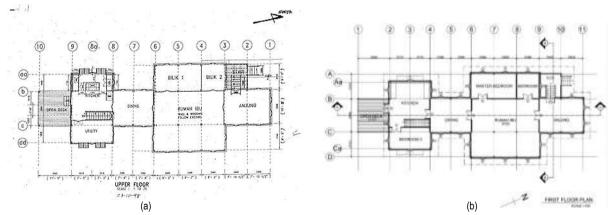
(a) Paper- sketch drawing (blueprint) of RUM; (b) Recreating original picture of first floor plan to 2D Drawing.
